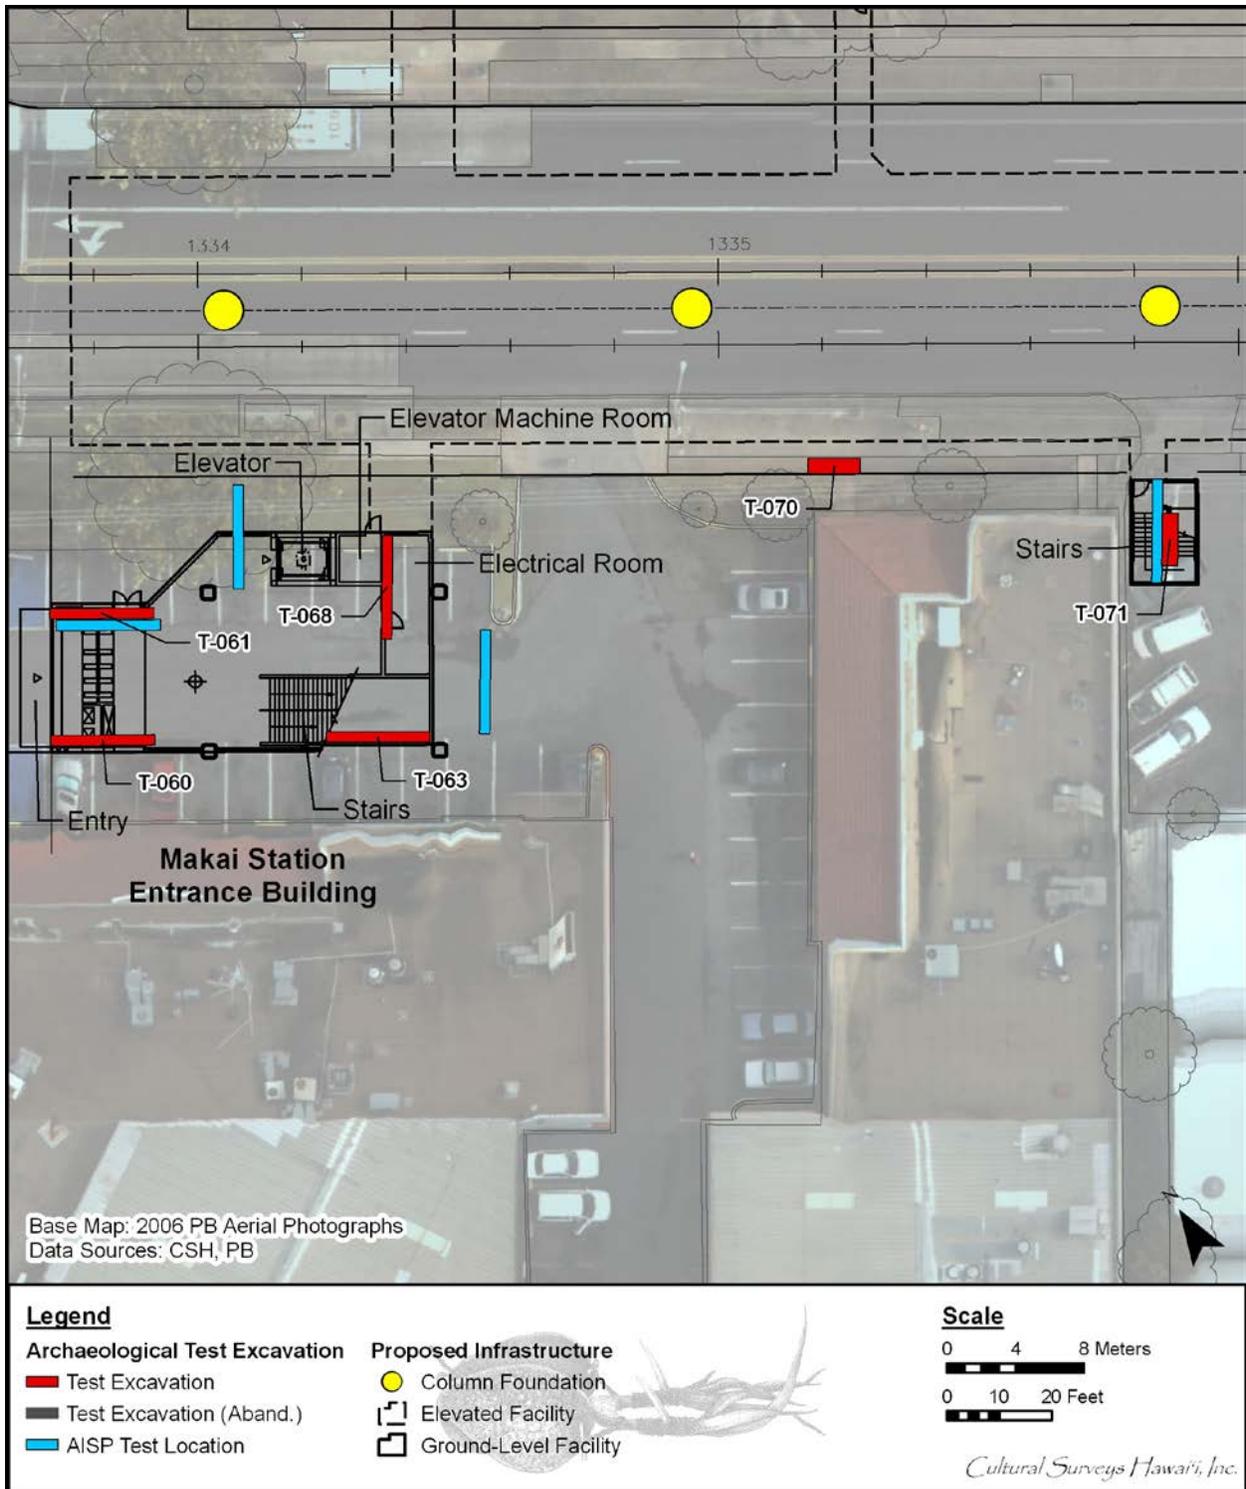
Kapālama Station, detail of (*makai*) Station Entrance Building showing locations of proposed AISP and actual AIS test excavations
